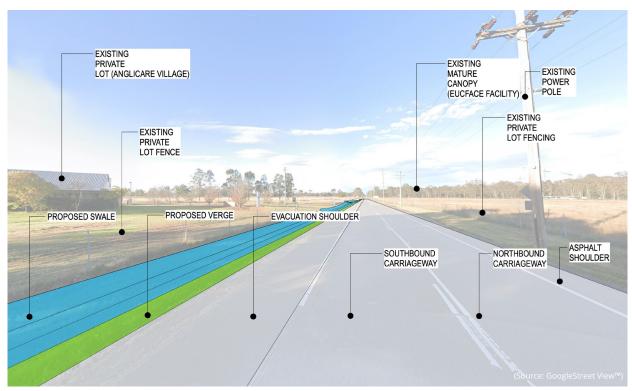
Viewpoint 12 - Entry to Anglicare retirement facility, Londonderry Road (facing south) - Proposal view
